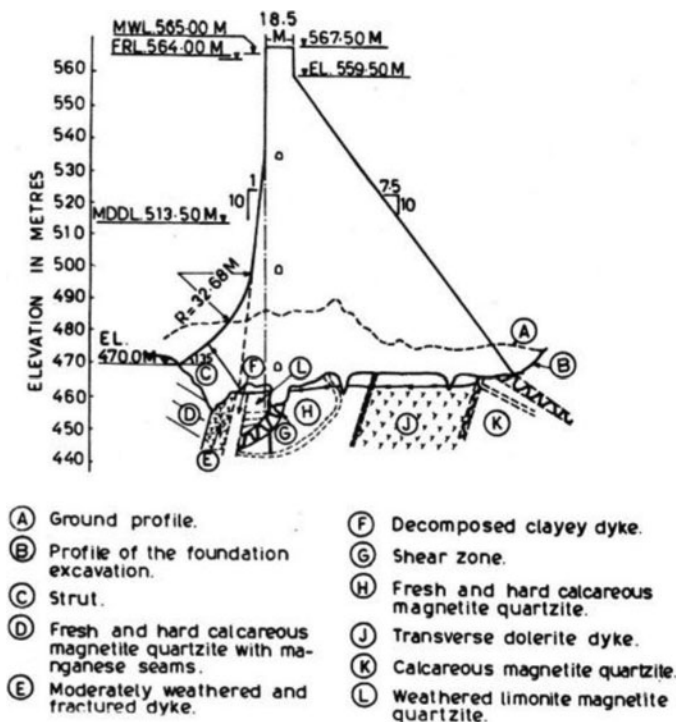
Supa dam section (block 7) showing heel strut.
